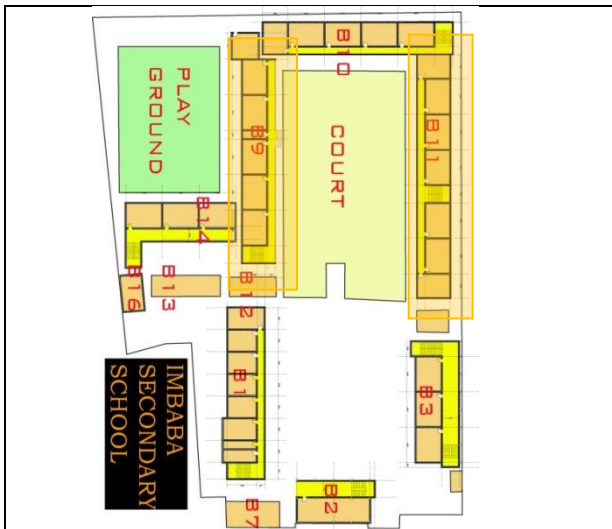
Imbabb Secondary School current Ground floor plan. “Researcher (2008)”.
